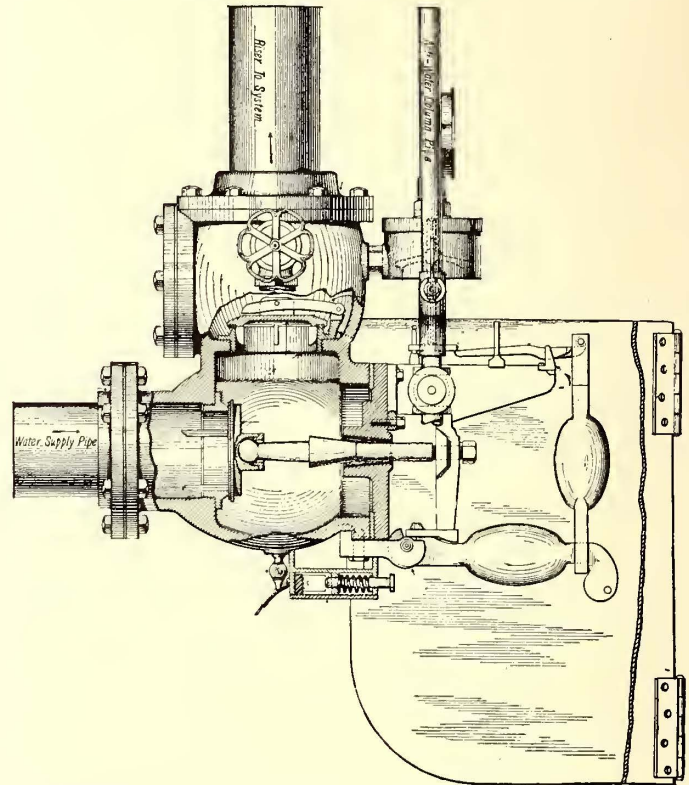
DRY-PIPE VALVE PLACED BETWEEN OUTSIDE WATER SUPPLY AND INSIDE AIR SYSTEM OF THE SPRINKLER PIPES
